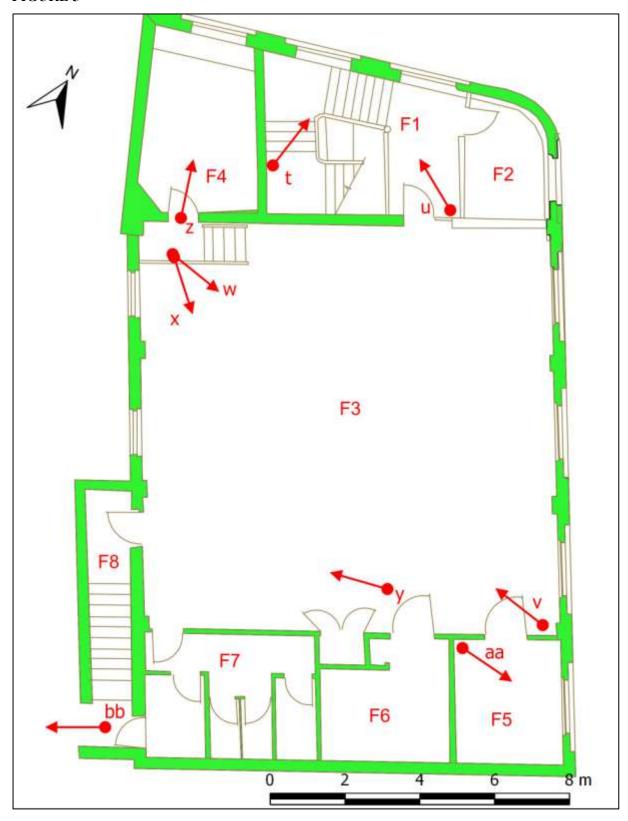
First floor of the study area, after plans supplied by Wellesley Project Management Ltd. Approximate scale 1:100 at A4.
